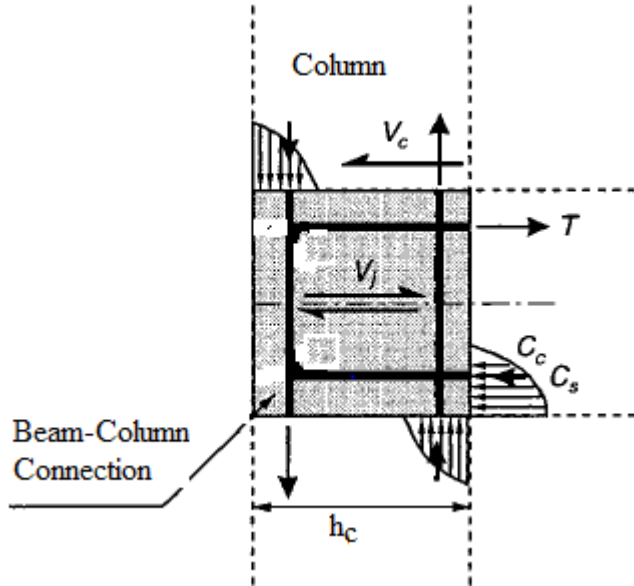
Horizontal Joint Shear Exterior RC Beam-Column Joints
